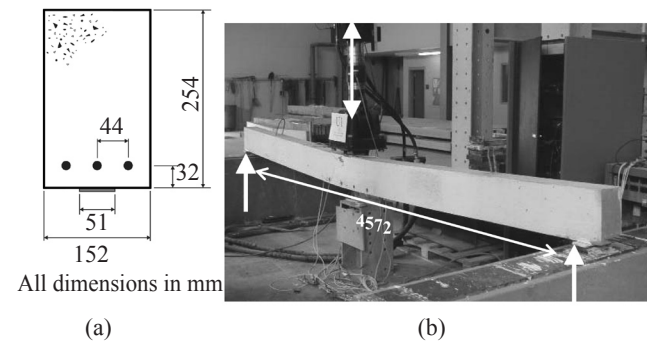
Reinforced concrete beam specimen setup: (a) beam details; (b) test setup
